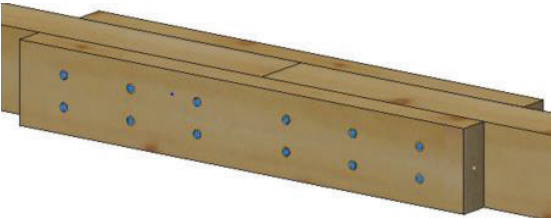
Lap joint with screws (4.5 mm x 60 mm)
